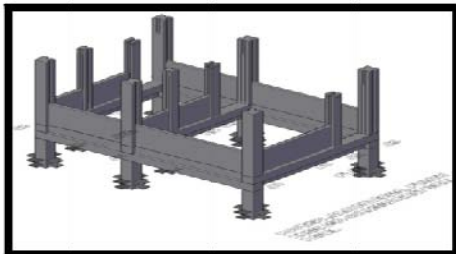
“connections of footings, ground & plinth beams, columns & wall panels”
